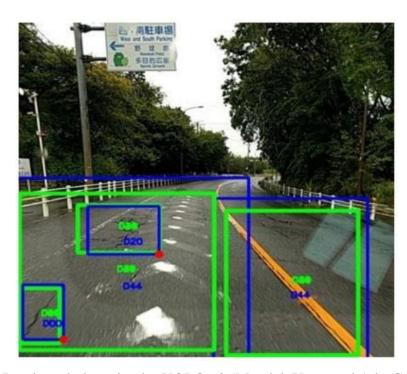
Road crack detection by YOLO v2 (Mandal, Uong and Adu-Gyamfi, 2019)
